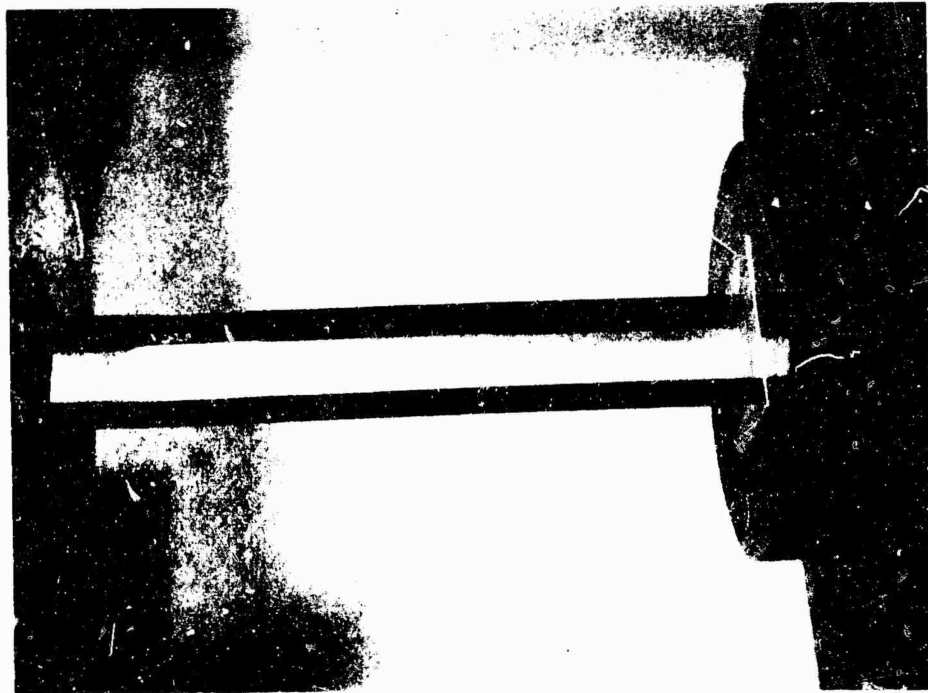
(b) -- U-Shaped Strut Loaded Below Critical Load.
